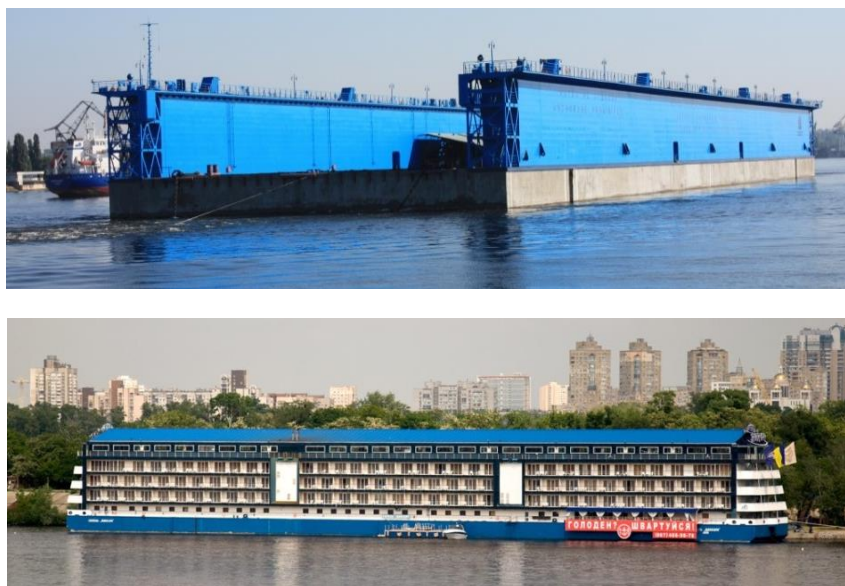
Floating dock and hotel with reinforced concrete pontoons. These structures were built at Kherson state plant "Palada".
